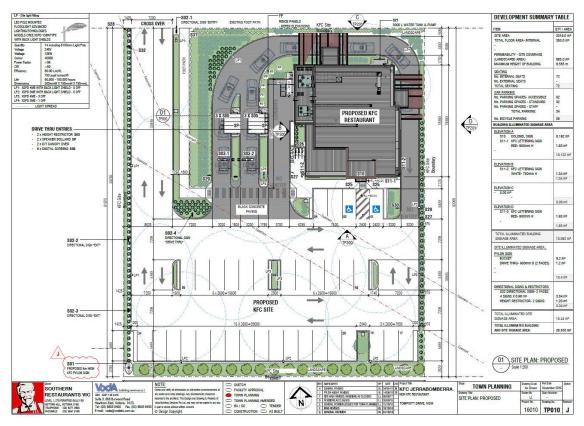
Site Plan Showing Location of Pylon Sign (Voda Building Services)
